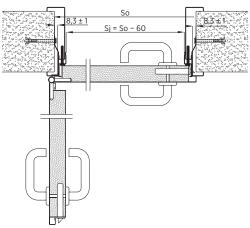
Installation of a single-leaf door with a wrap-around frame – horizontal cross-section
